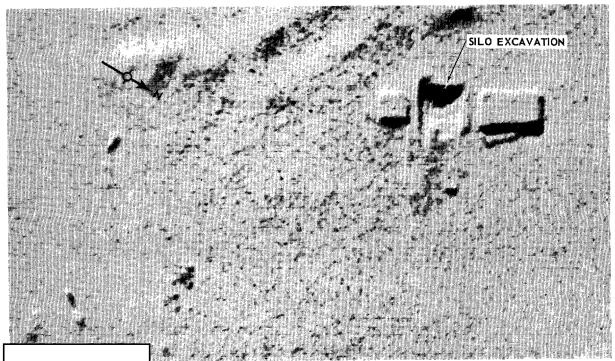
REMOVAL OF CONSTRUCTION SUPPORT BUILDINGS AT ZHANGIZ-TOBE LAUNCH SITE 56I
